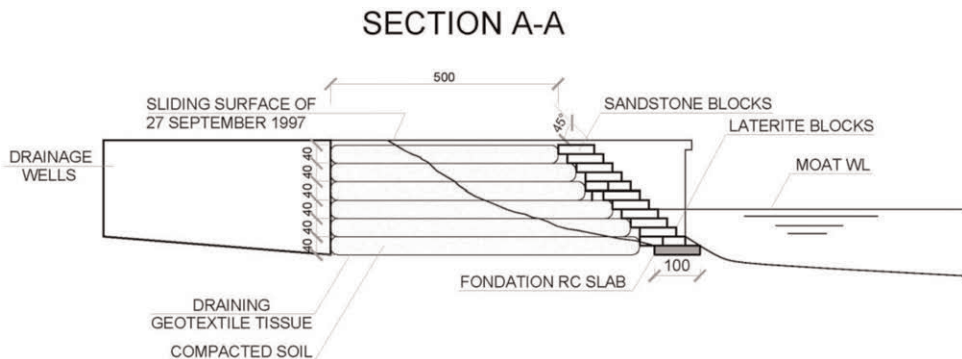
Restoration intervention- Geotextile package assemblage in the embankment section.
